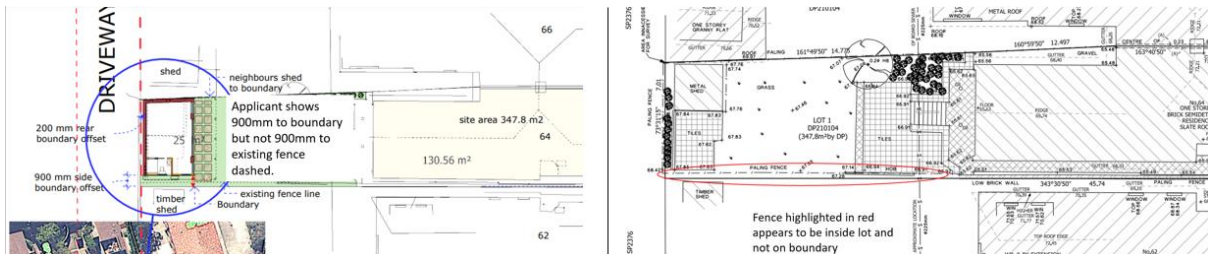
Annotated Site Plan - Dwg No. 1 (left) and Annotated Survey Plan – Dwg No. 33484-04 (right)
